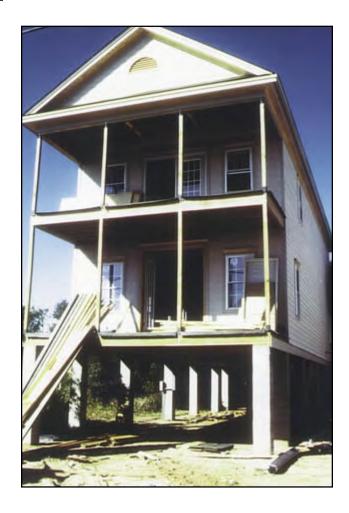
shows an open masonry foundation with only two rows of piers. It is unlikely that this foundation system could resist overturning caused by the forces described in Chapter 11.
